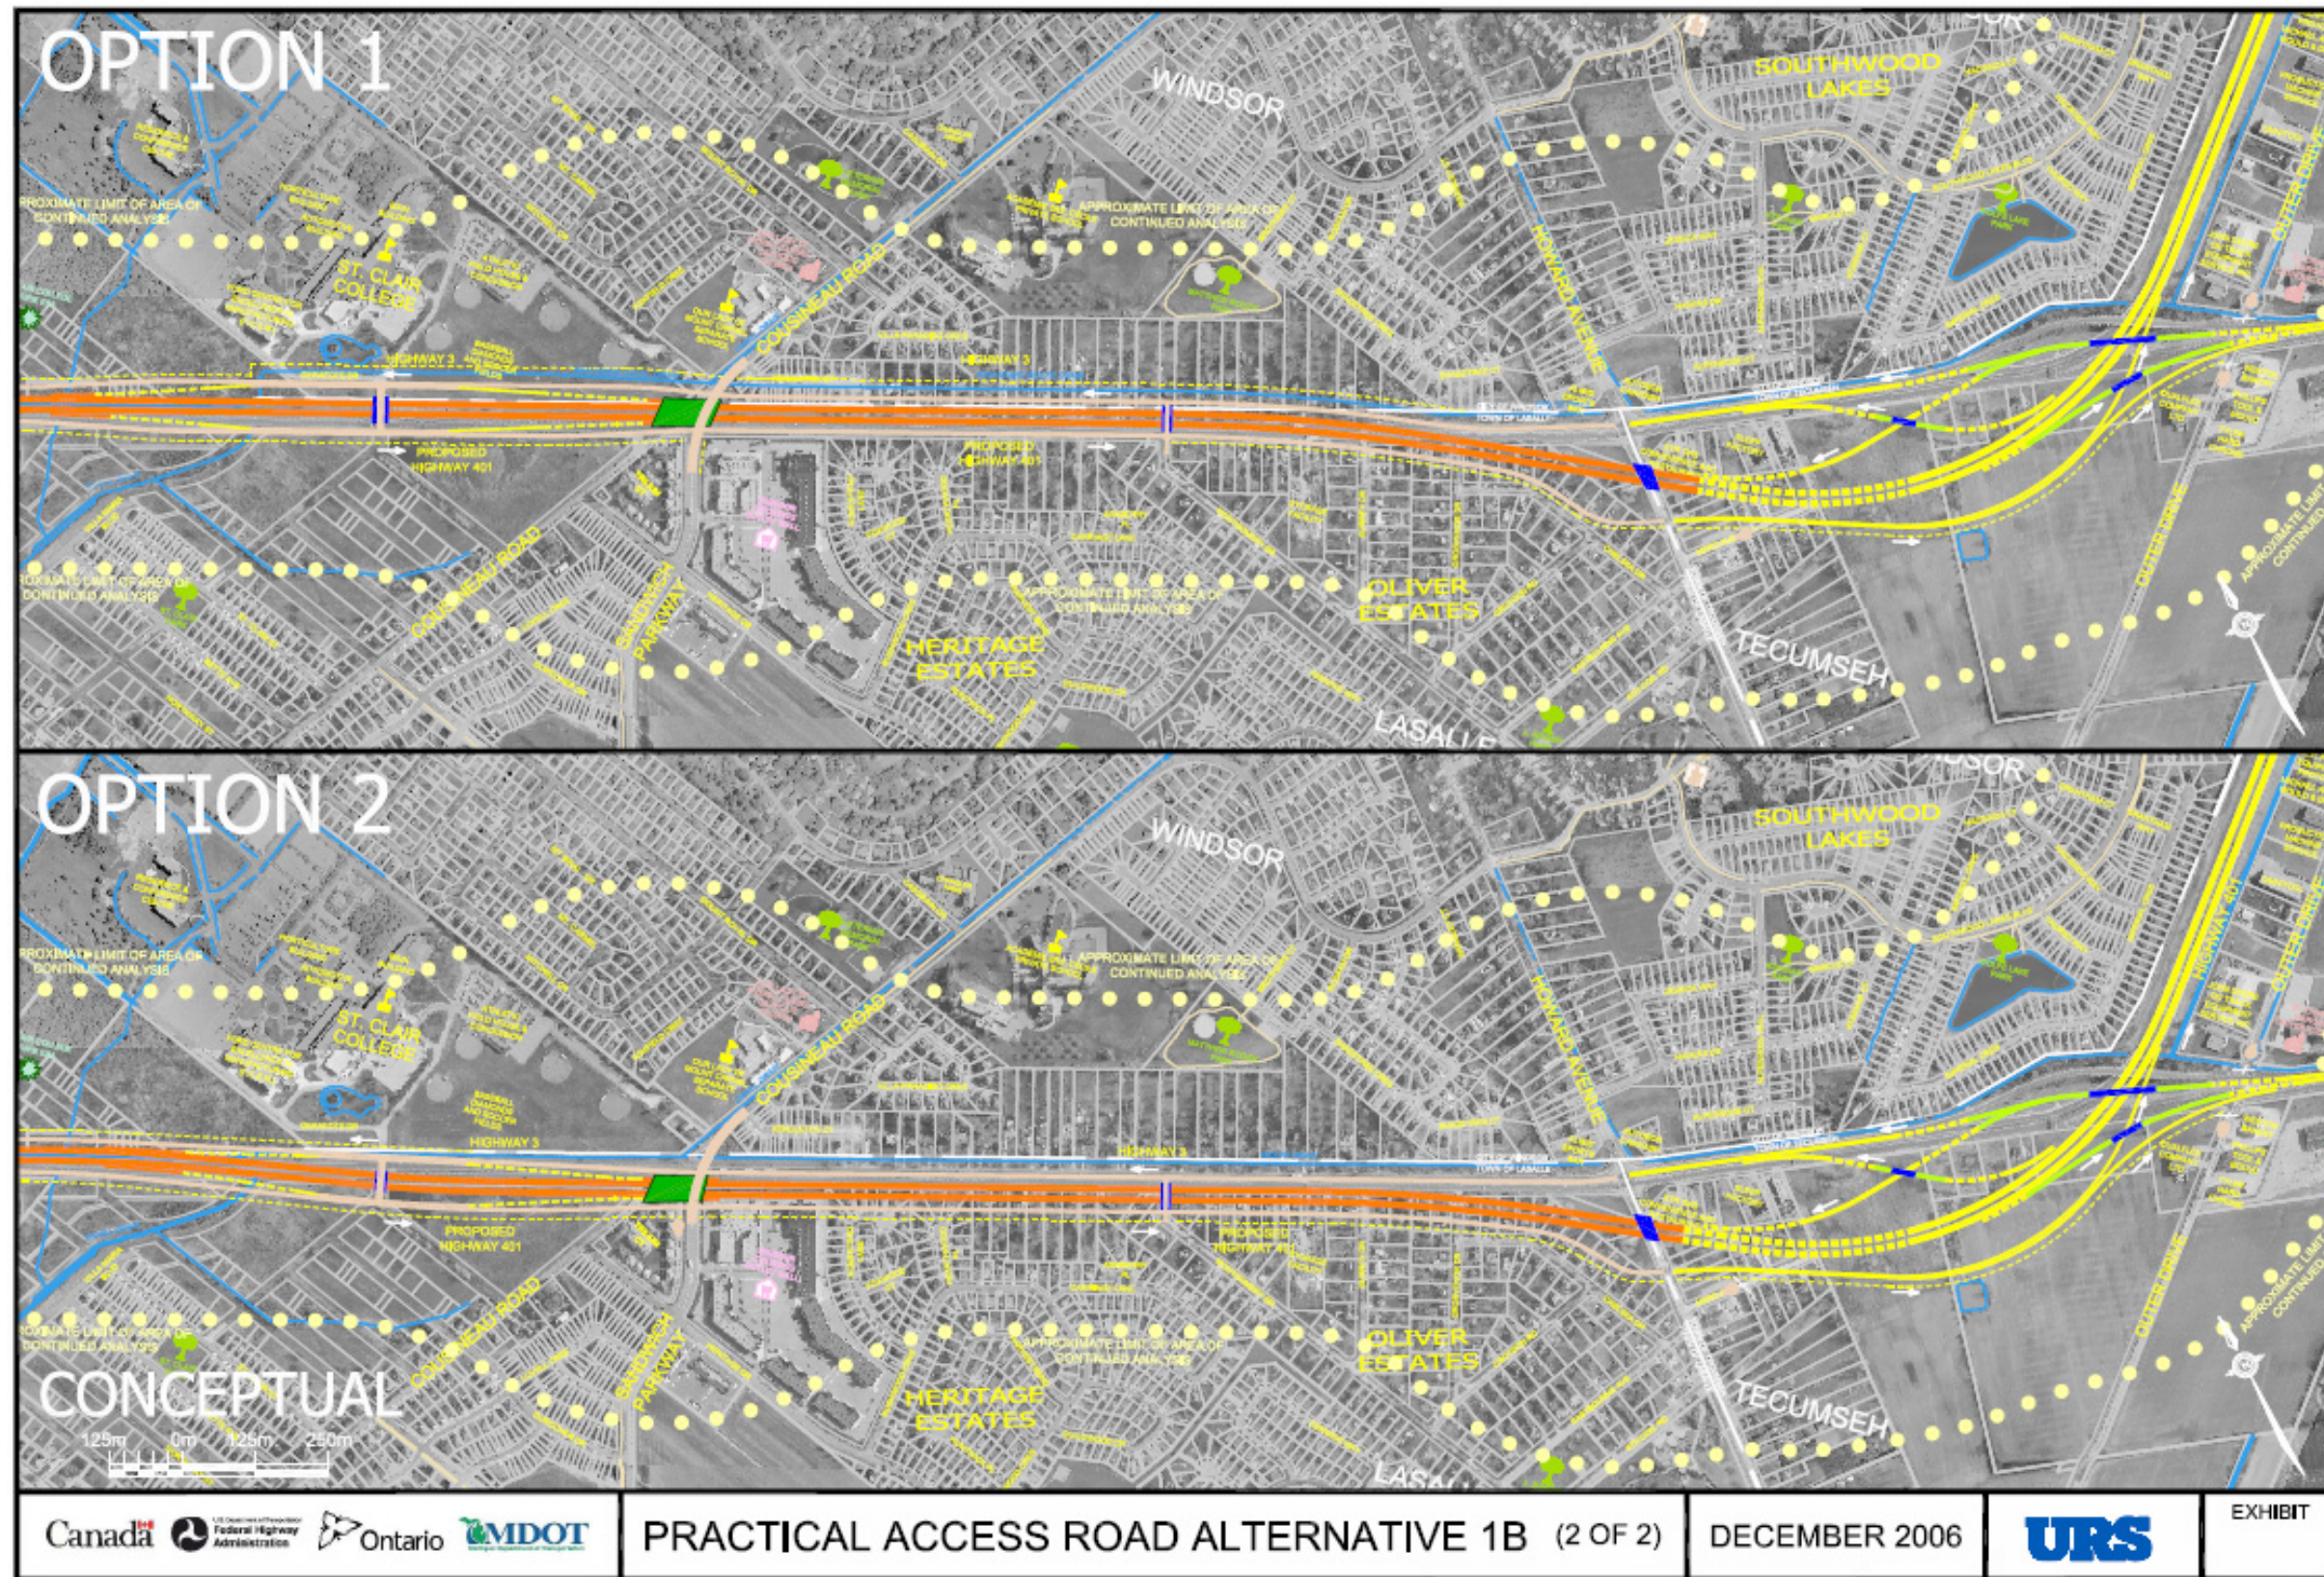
B – PRACTICAL ACCESS ROAD ALTERNATIVE 1B
